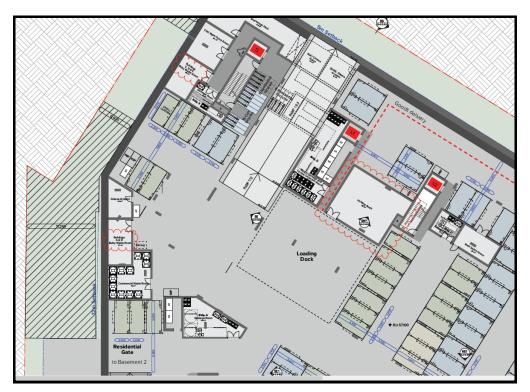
Proposed loading dock and bin holding room (Source: Turner, 22 March 2023)
